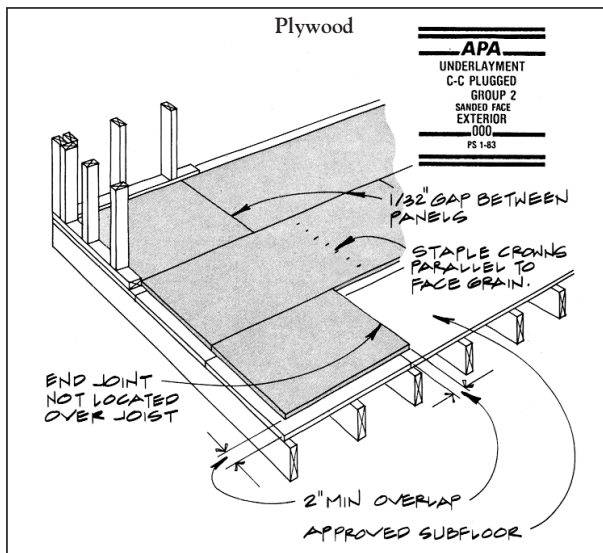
Plywood underlayment should be laid perpendicular to the floor joists. Space end joints 1/32 inch apart and don't locate them over joists.
